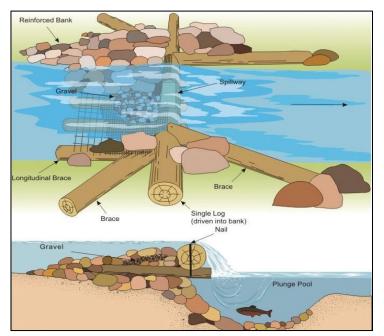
Aerial view (above) and cross section (below) of a single log rock dam
